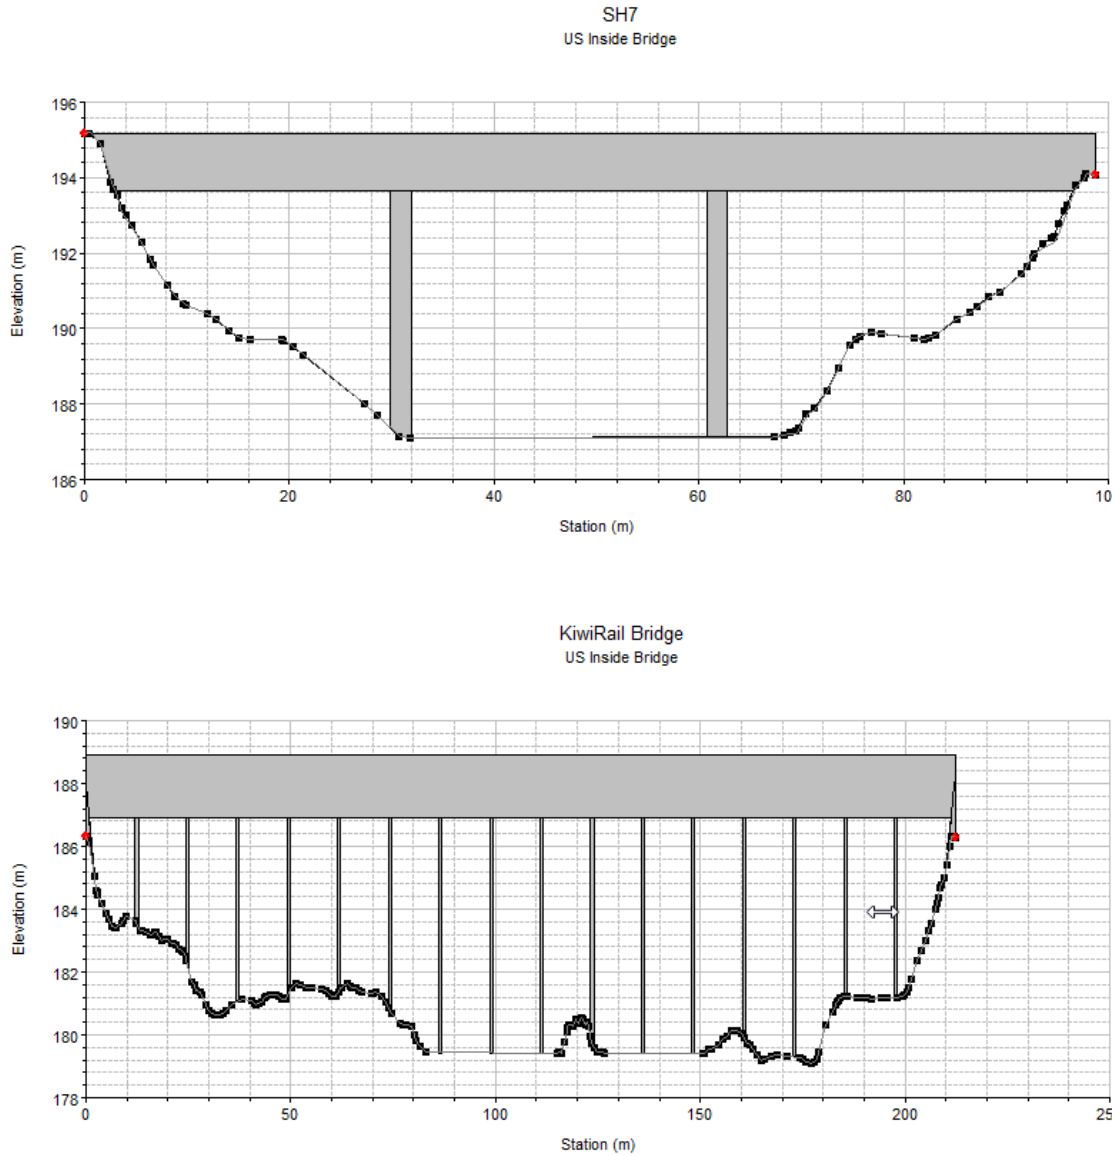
SH7 and KiwiRail Bridges as incorporated into the Reefton-Inangahua River hydraulic model.
